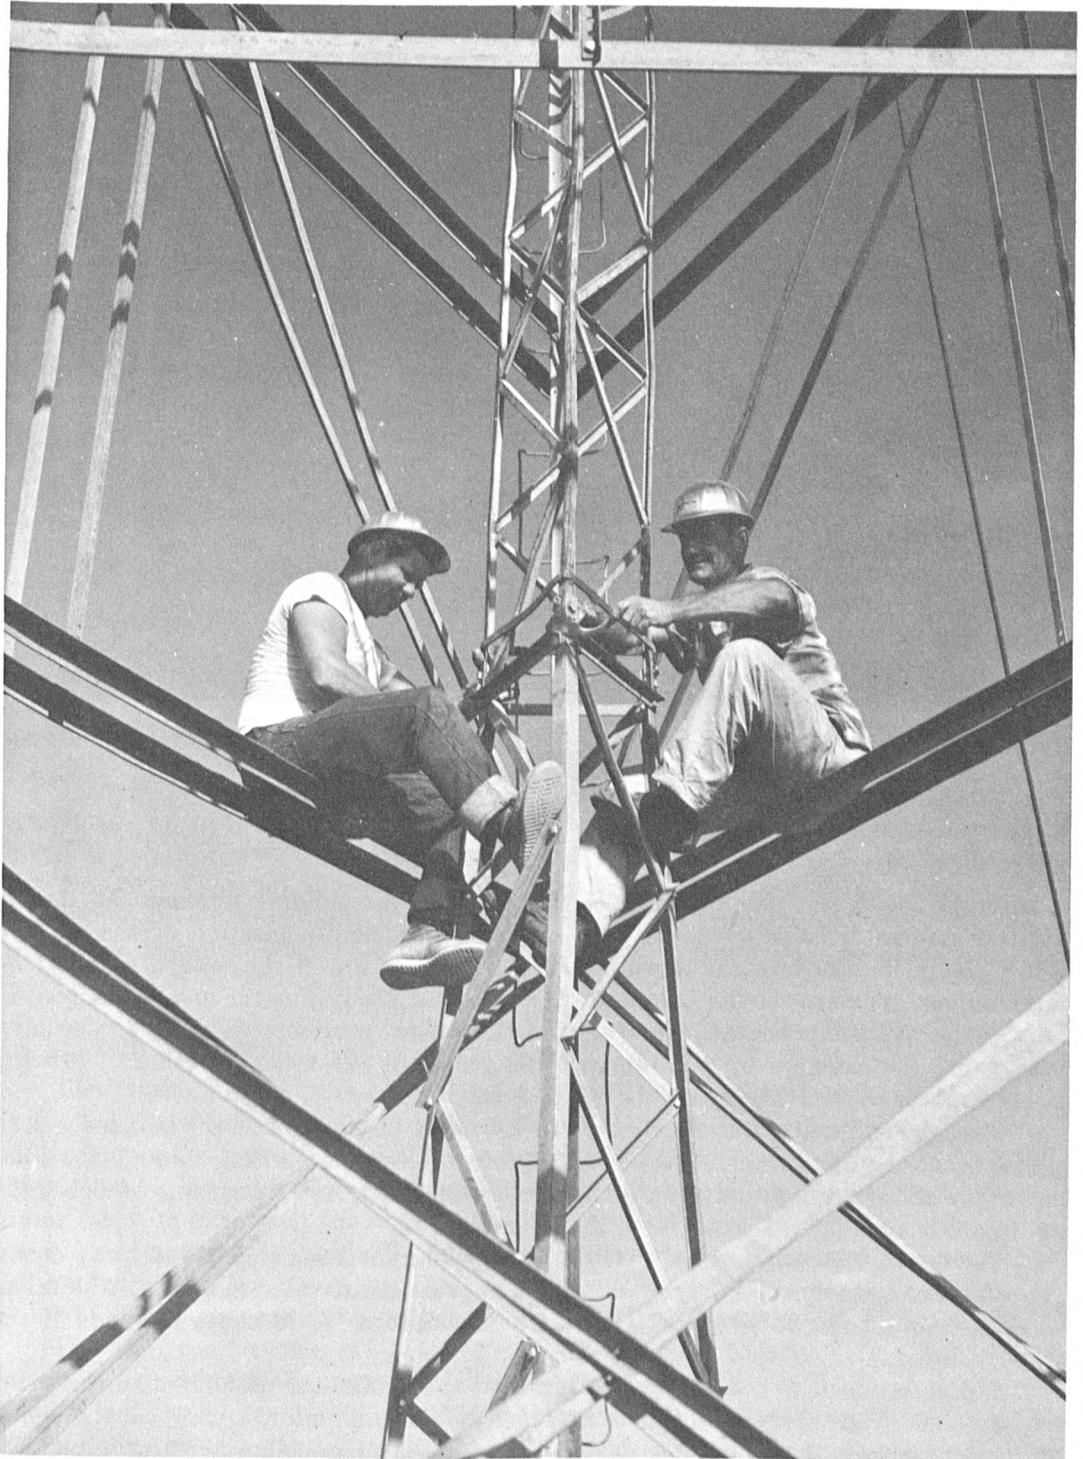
Bolting the welded section to the built-up section.
